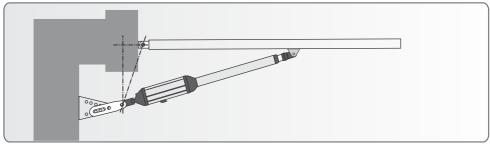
INSTALLATION ON AN ANGLED WALL
